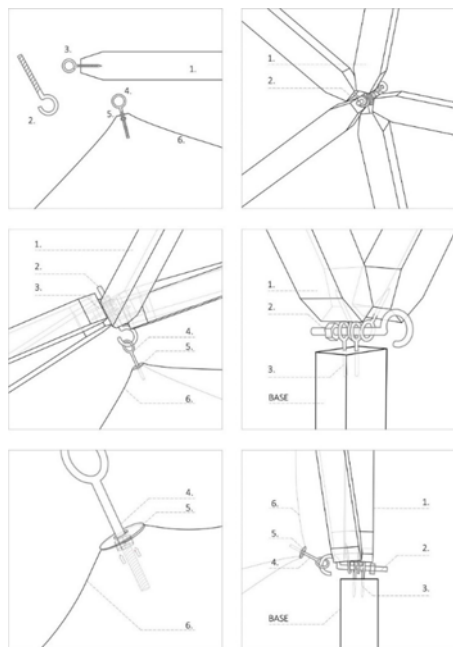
Construction details: (1) Brushed pine wood strip 36x36mm; (2) Open steel bolt Ø15mm; (3) Eyebolt with wood thread; (4) Closed steel bolt Ø10mm; (5) Eyelet riveted to the membrane and (6) Textile membrane © Beatriz Arnaiz Barrio / LHRC Architecture Collective
